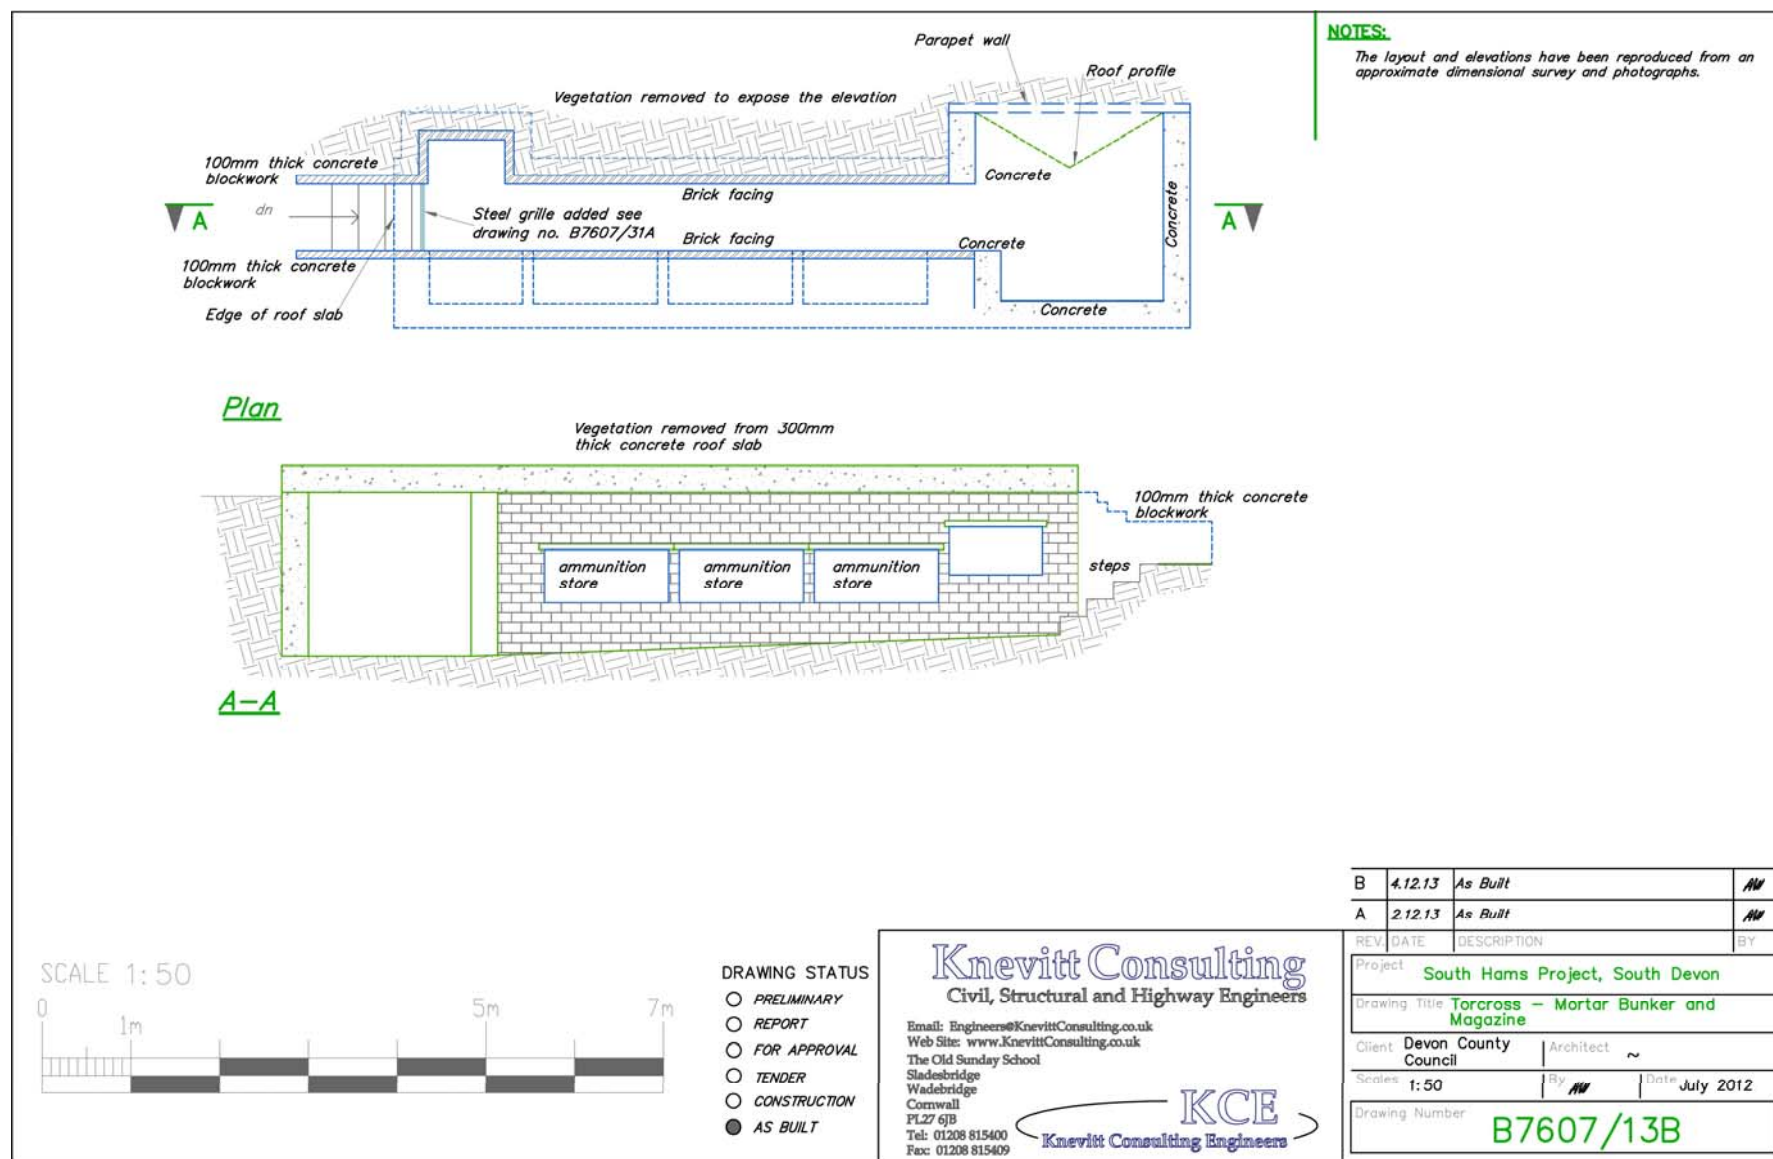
Survey plan and section of the mortar bunker and magazine after works © Kneivitts 4/12/13.
